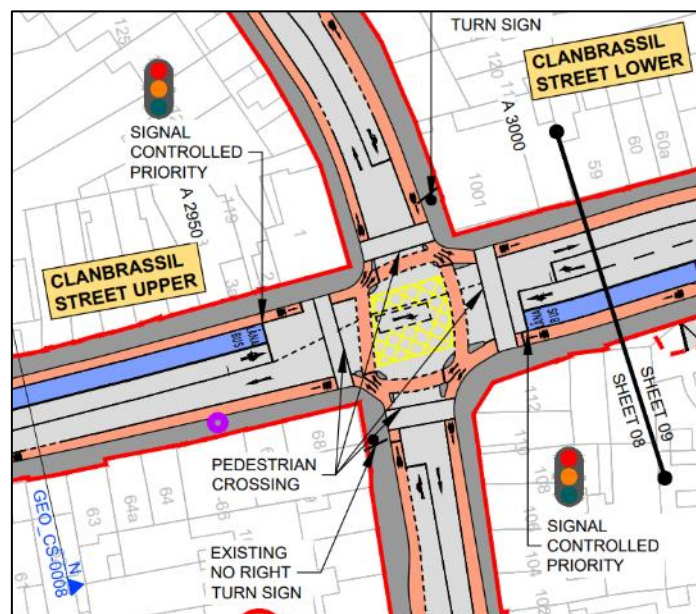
Proposed Scheme Layout at Leonard’s Corner Junction
